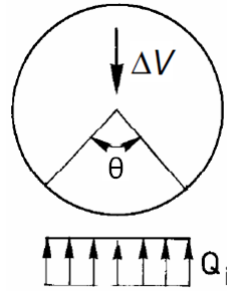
Earth load Q_i acting on the pipe-line cross-section. [2]
